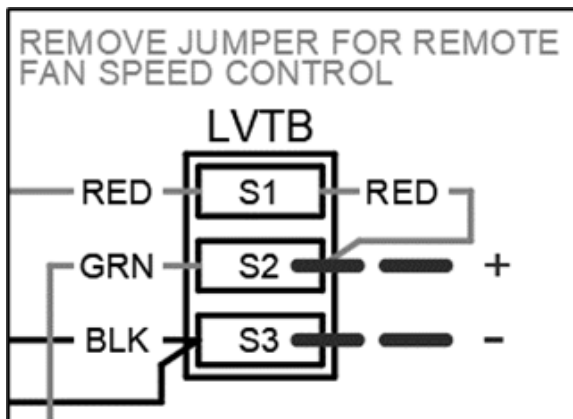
Shows the Jumper That Is to Be Removed (Jumped Between S1 And S2)
